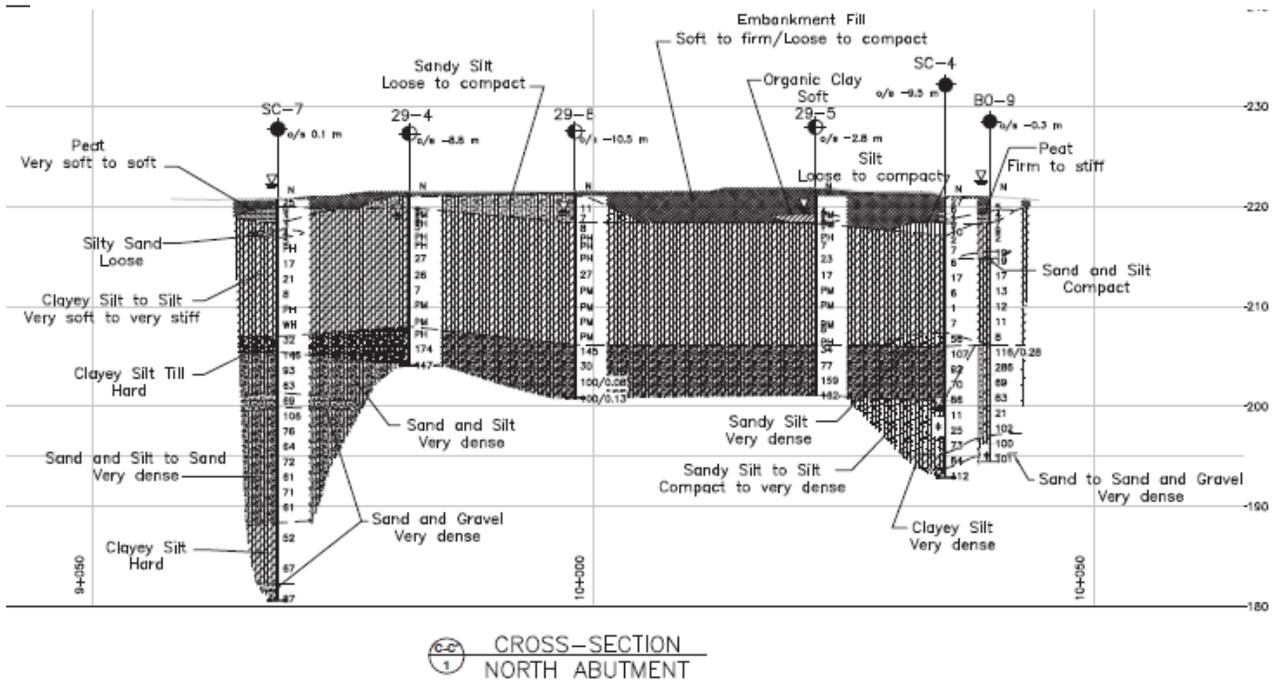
Site #2 – Typical subsurface section at the area of the test pile
